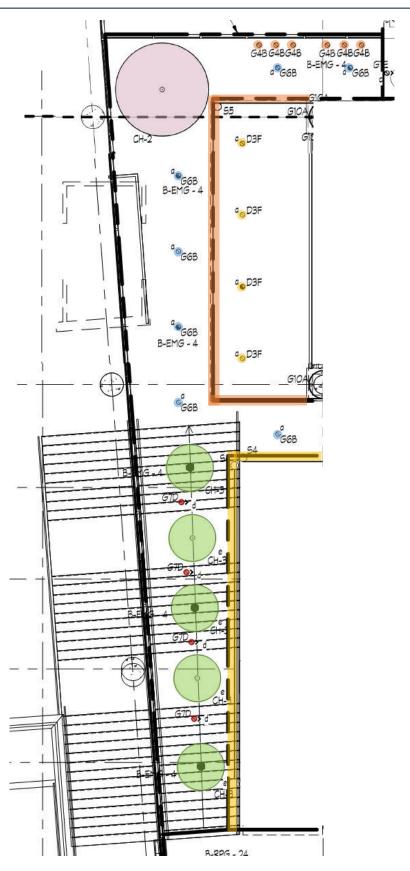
| Ground Floor Lighting Layout - Lower Level Lobby + E-Lounge
